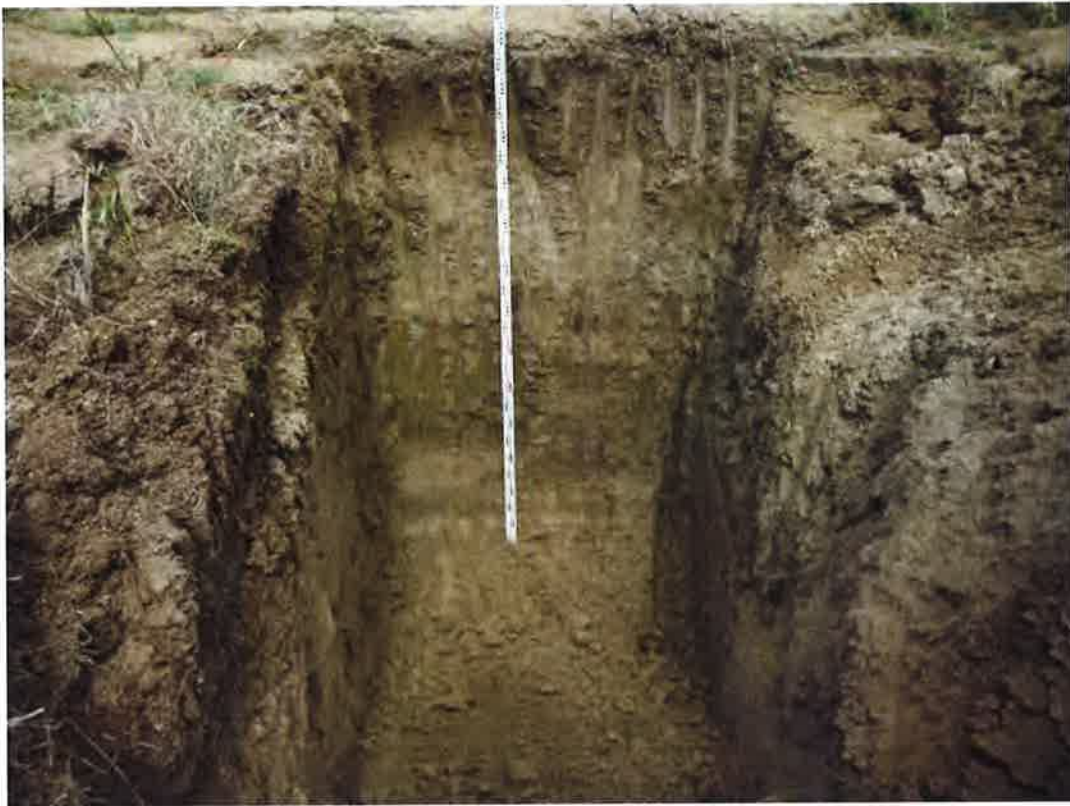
Test Pit: 2. Overall view of test pit upon completion.
